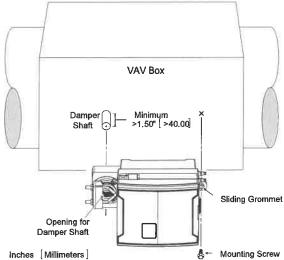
Standard Mounting Method: Mounting a controller on a damper shaft
